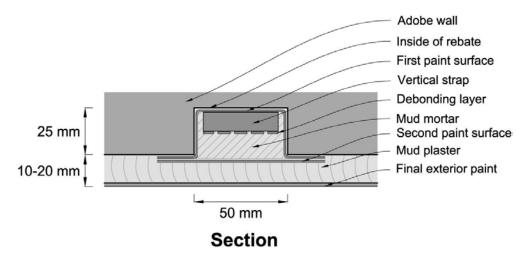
A section through a wall rebate and strap to prevent strap corrosion in wet climates.
